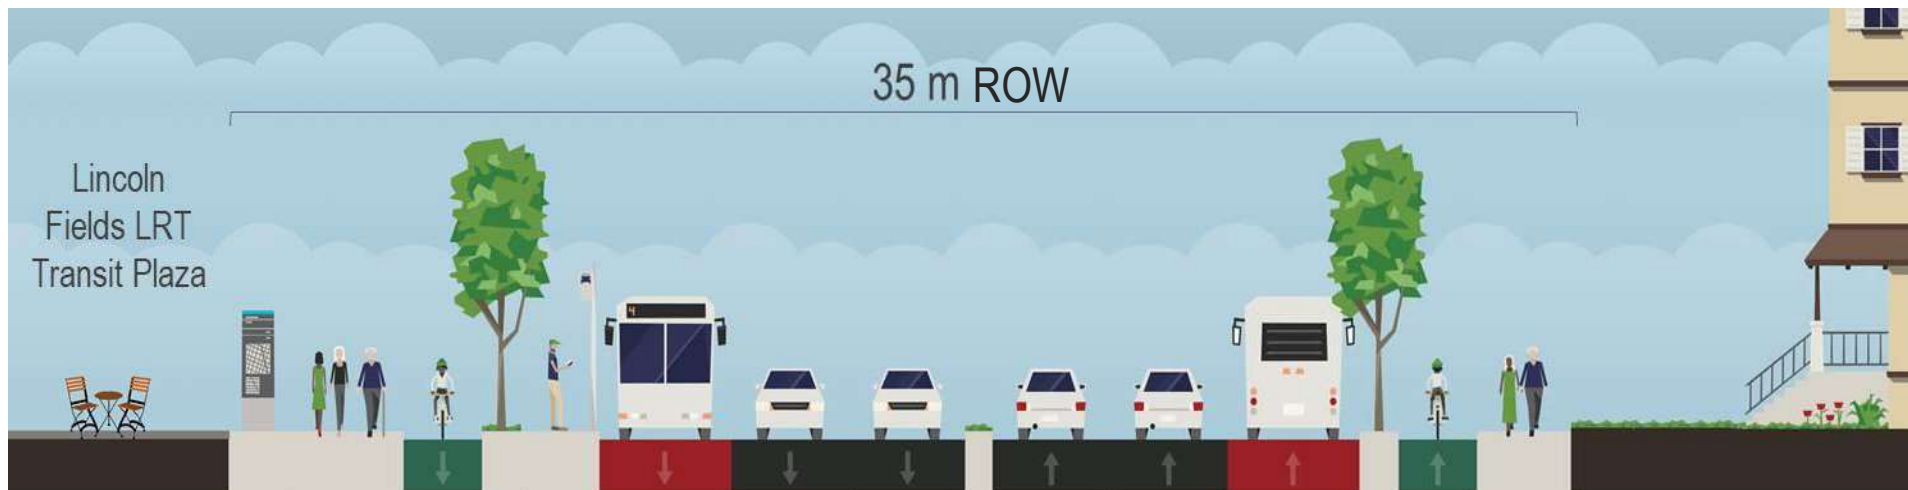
Carling Avenue street cross-section (SURP, 2019)
